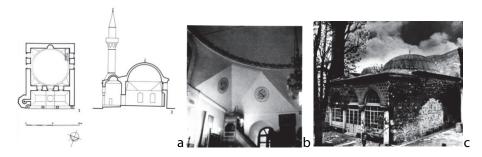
Mosque of Alaeddin Bey in Bursa, a) plan & section, b) interior, c) exterior
